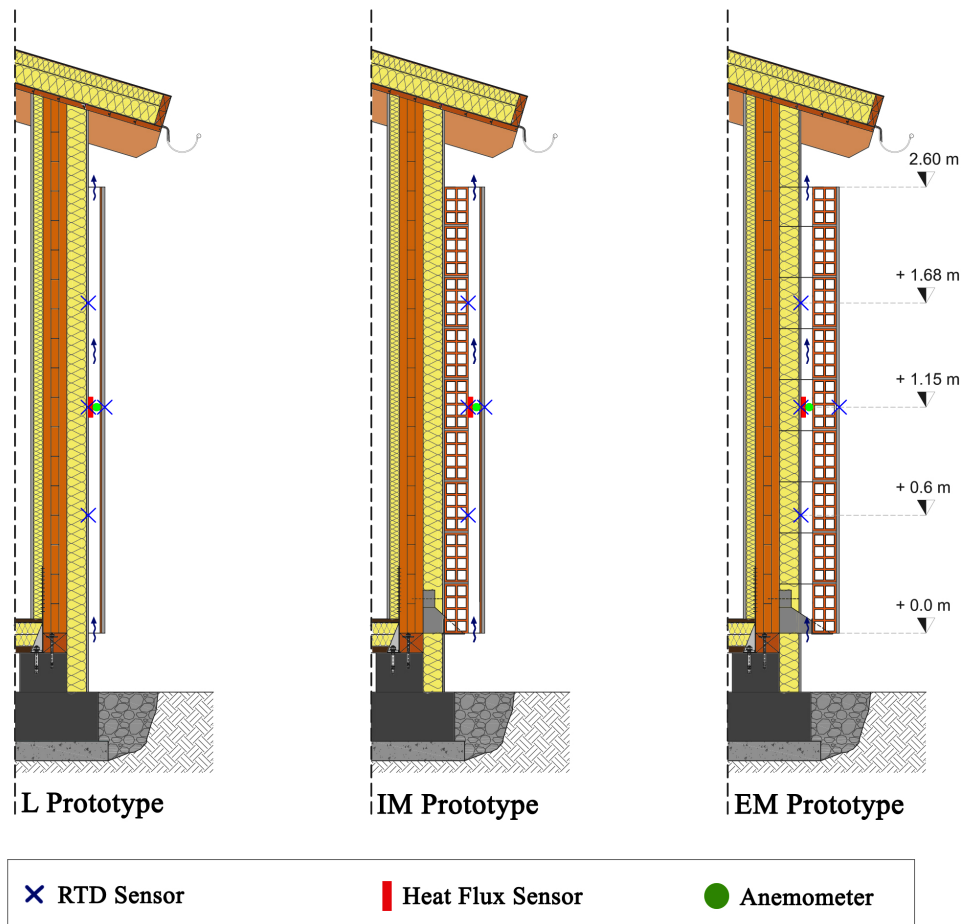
OVFs section drawings for L, IM and EM walls, with probes installed at different heights.
